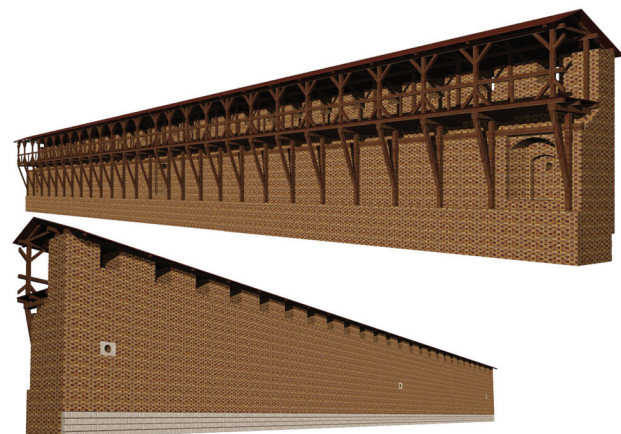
Sections and views of the stage I wall under reconstruction (drawn by the authors)
